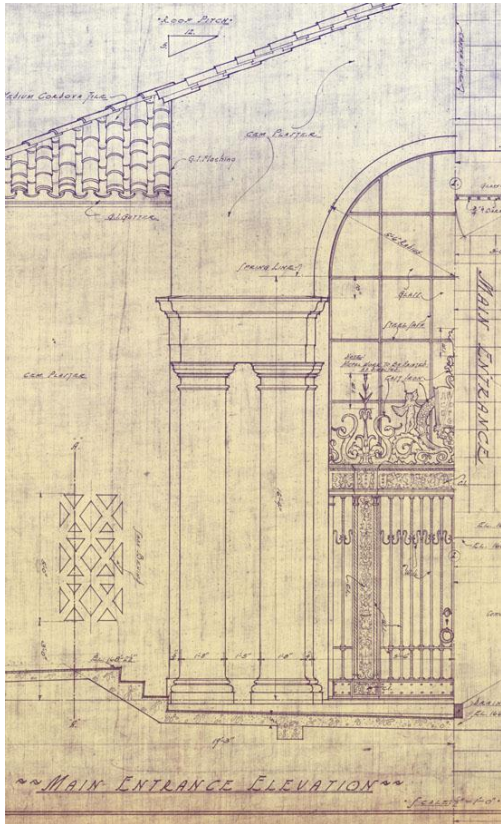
Detail of entry pavilion of Science Building (Woods Hall)
